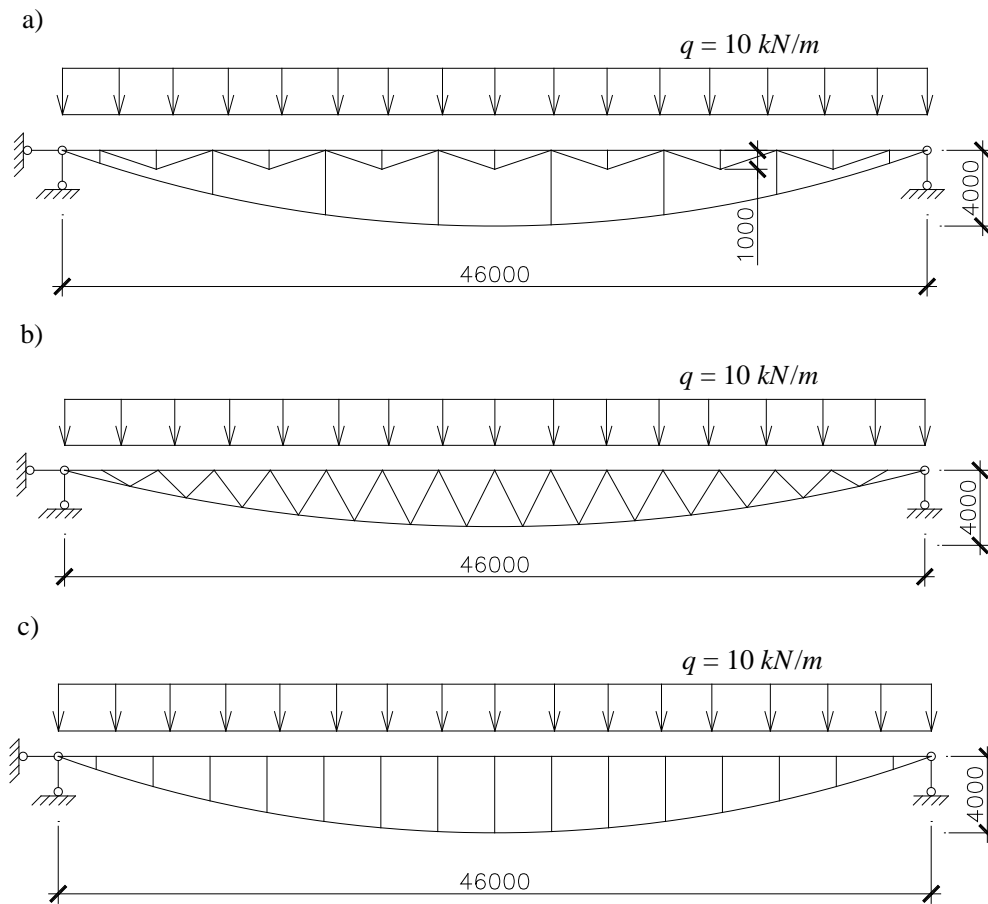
Types of trussed beams. a) – trussed beam with strut frames; b) – trussed beam with triangular web; c) – trussed beam with vertical struts (Spatial bracings conditionally are not shown in Fig.1)
